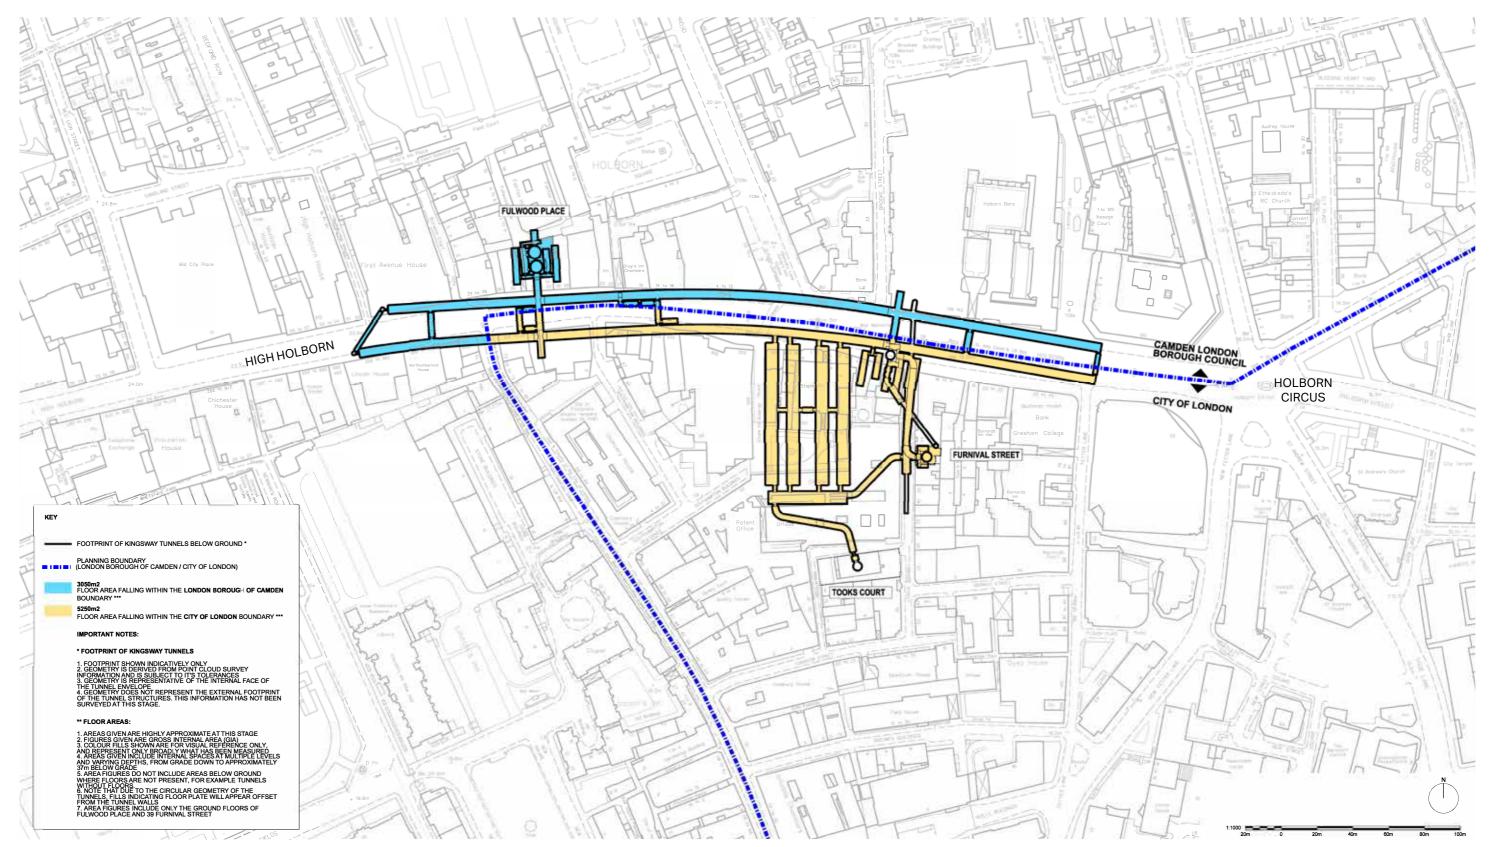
Site plan showing extent and boundary line between London Borough of Camden and City of London (not to scale)
